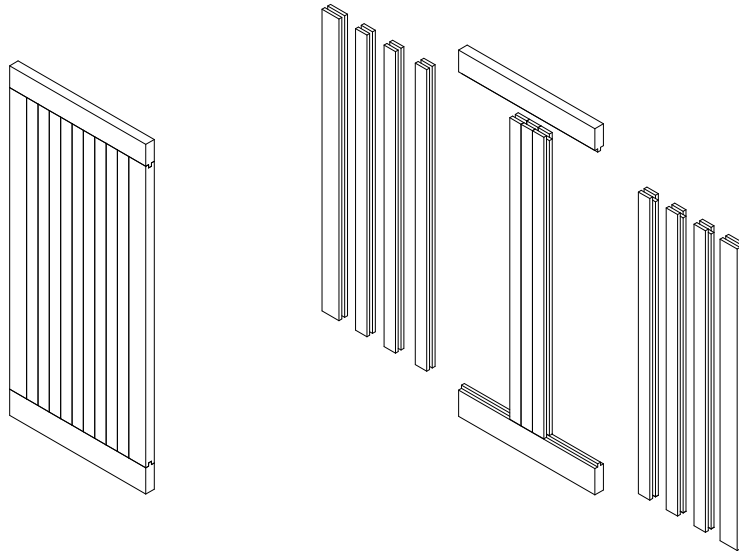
Exterior Door – Option B: Spline – Assembled & Exploded Views
